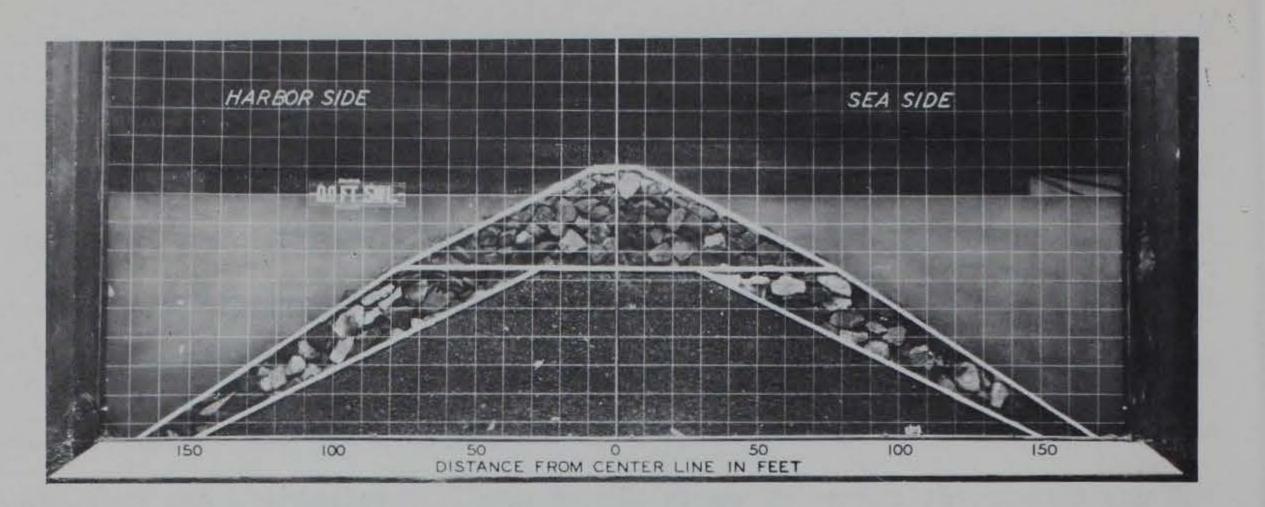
Investigation of Iribarren's formula, elements of typical test section
